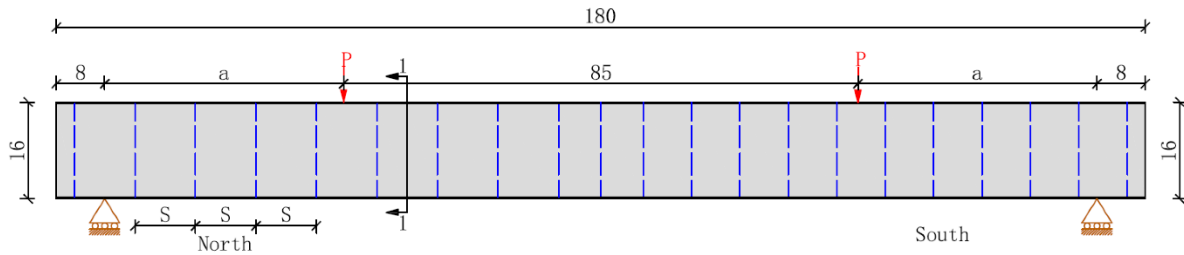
Elevation of S-UHPC beam. Unit: Inch
